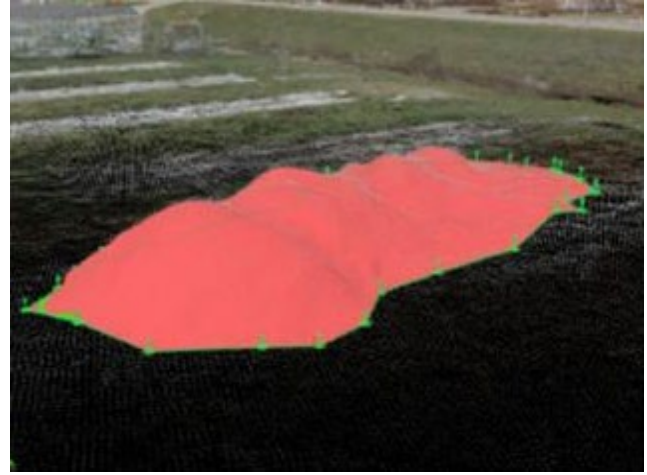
Stockpile Calculation. (Image Wang, 2018)
